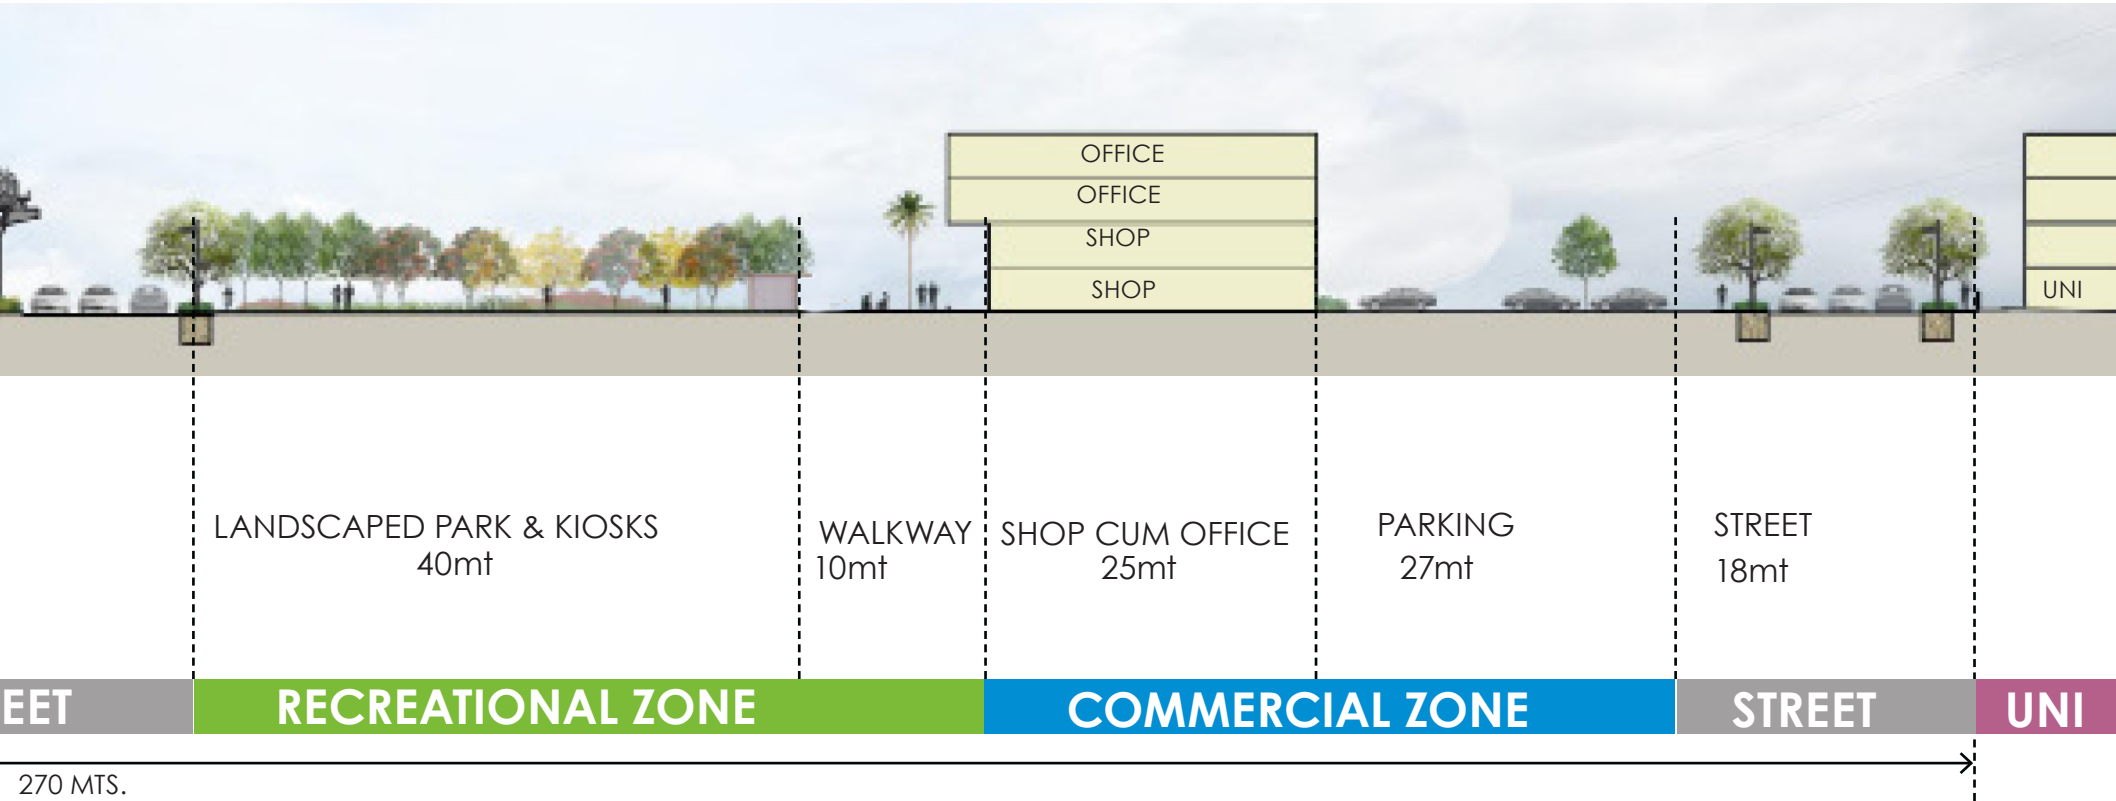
Proposed section of Orchard Avenue & Retail areas through Education City
